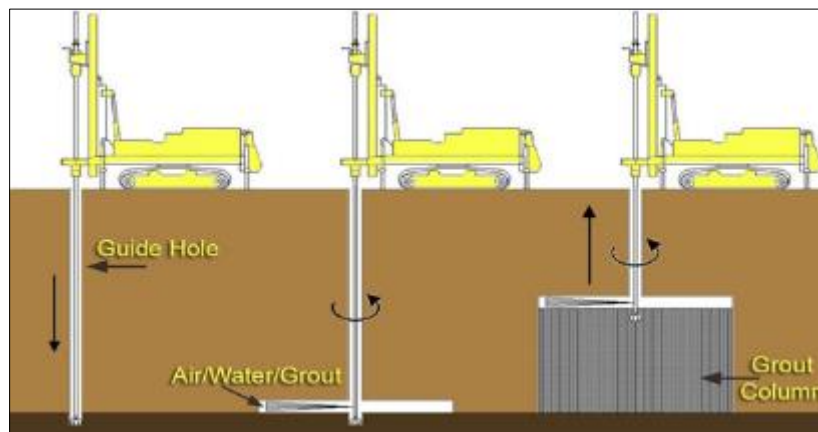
Schematic of Deep Soil Mixing and Jet Grouting processes
